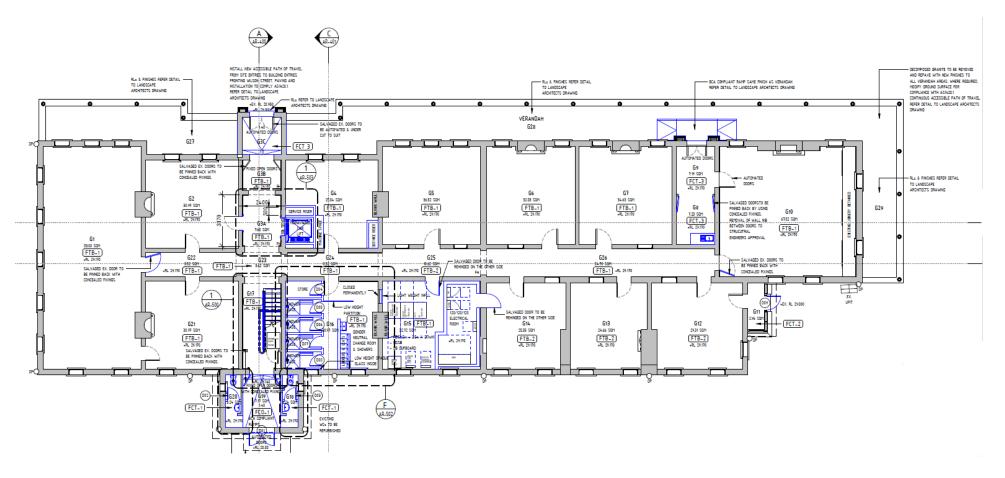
Proposed Ground Floor Plan. The proposed layout is consistent with the original general arrangement of the building, proposing minor alterations only. Source: CCG Architects, 2022.
